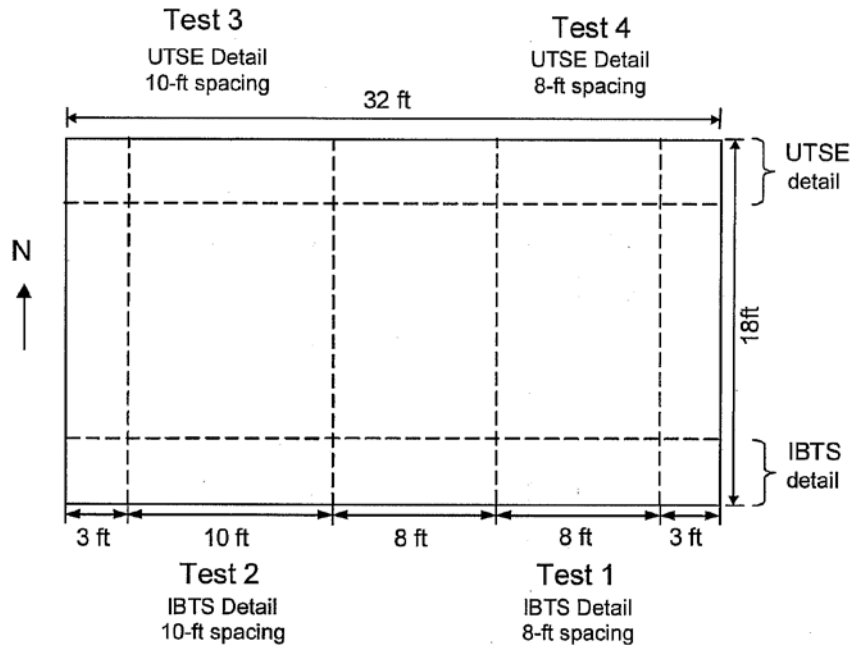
Plan View of First Specimen of TxDOT Project 0-4418 (Ryan 2003)
